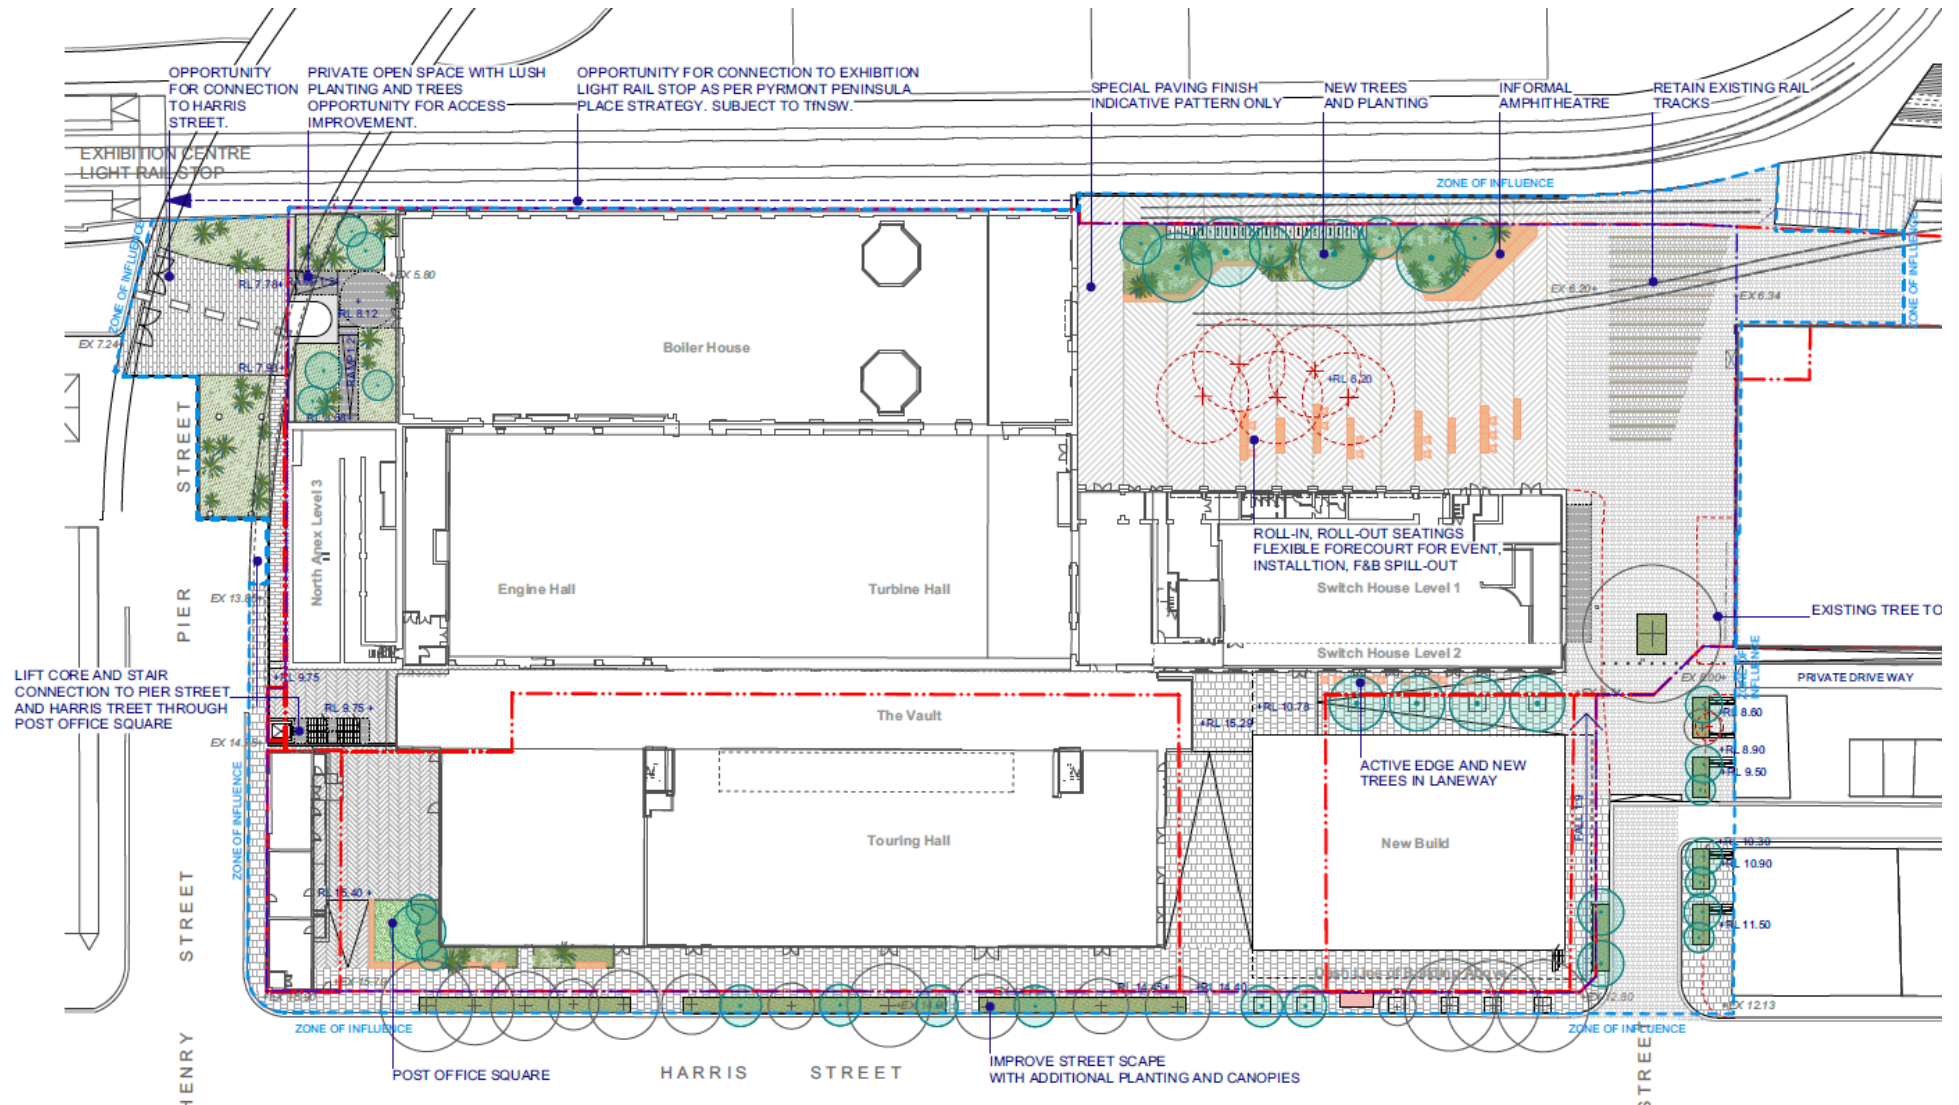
Powerhouse Ultimo Renewal- Landscape Plan LA-101 Rev B (Aspect Studios 2022)
